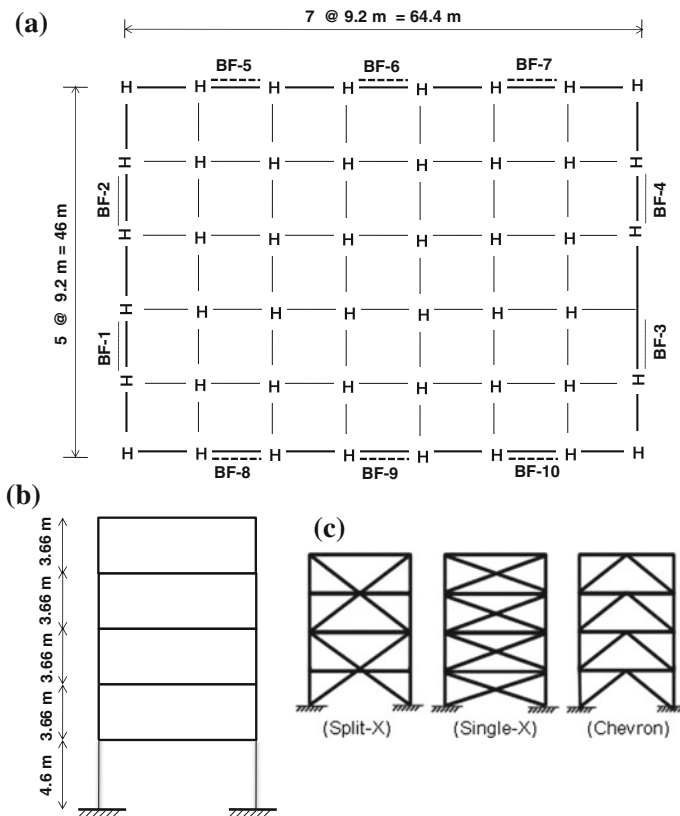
a Building plan, b Elevation of 6-storey frame, c Brace configurations
